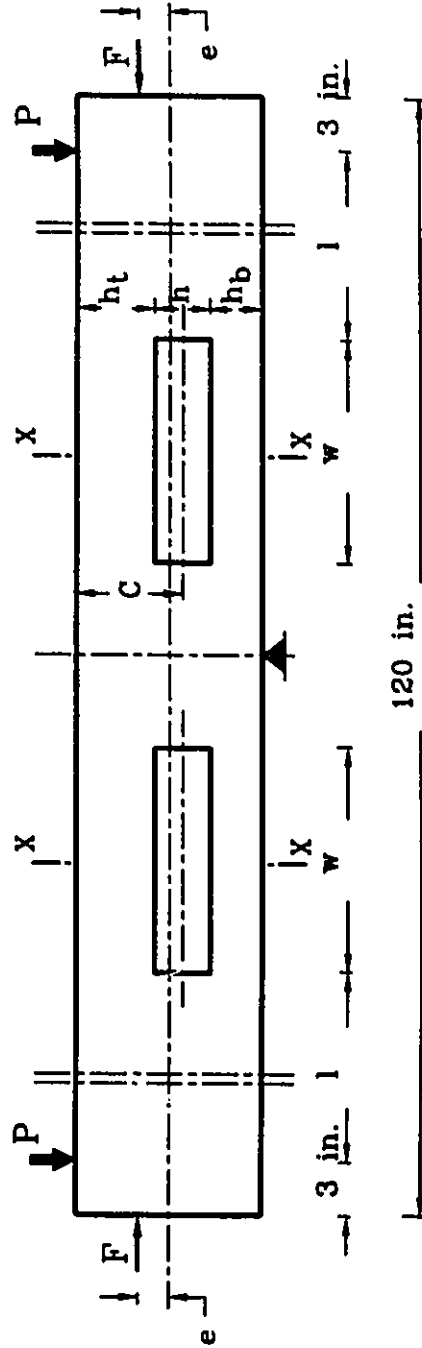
TYPICAL RECTANGULAR BEAM LAYOUT
